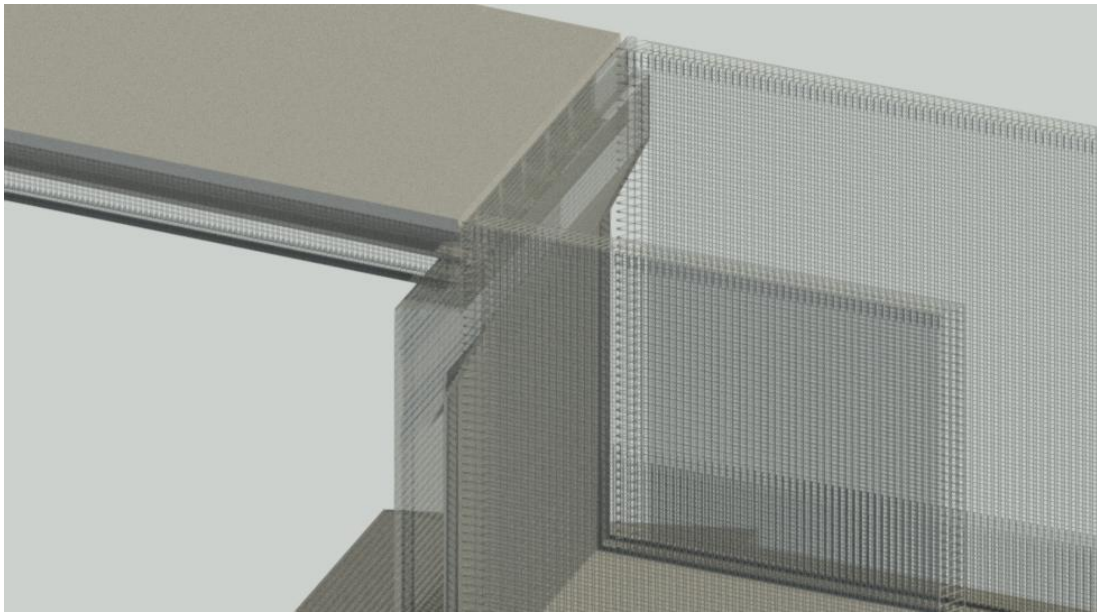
“Las Arenas Viaduct” virtual model, abutment, reinforcing bar detailing view.
